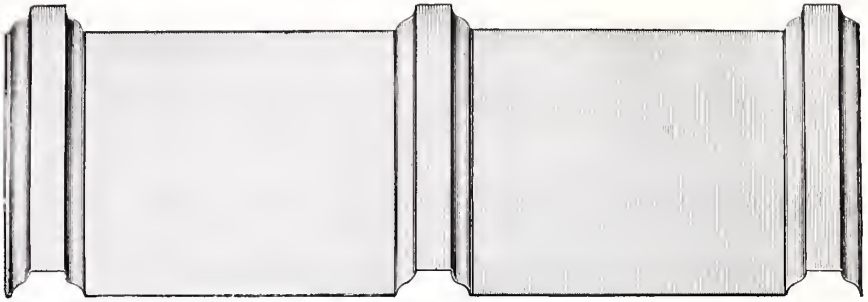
Shows short sheet of O. G. Siding, Crimps 12 inches apart.
